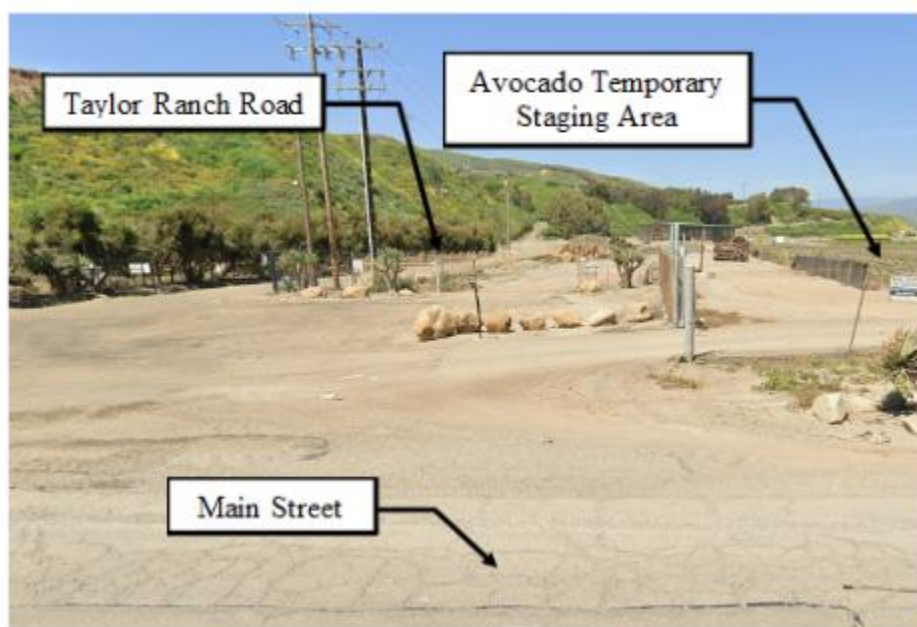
North-facing view of the entrance to Taylor Ranch Road from West Main Street
